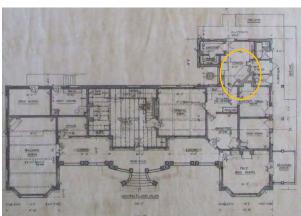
Location of kitchen range as shown (circled) on the original ground-floor plan.
